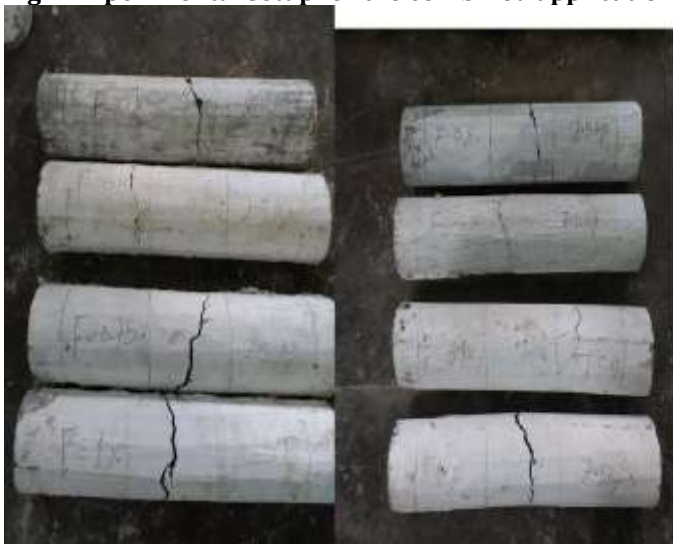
shows the tested beam specimen of flexure, tension and shear
